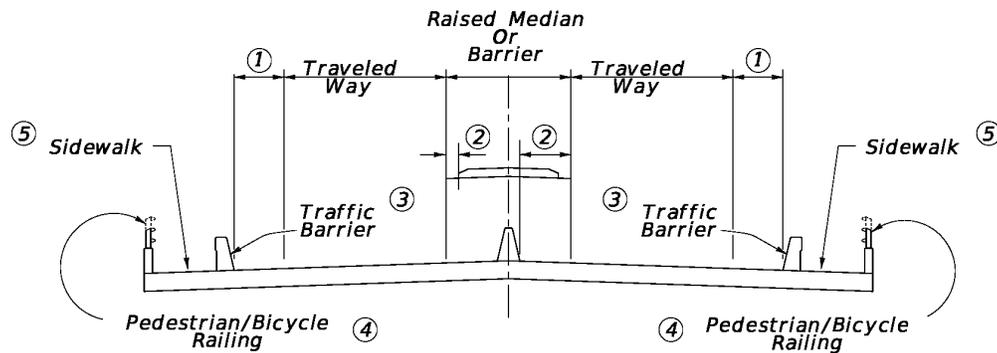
Bridge Section for Divided Arterials and Collectors
